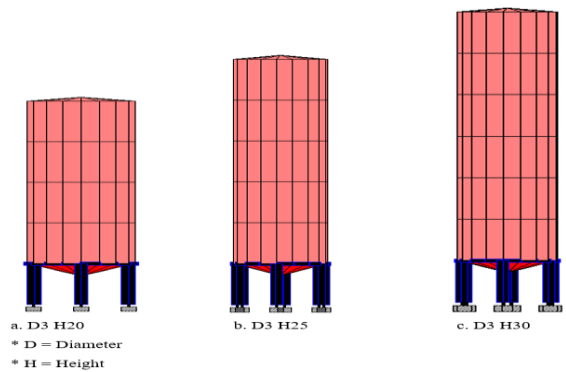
Elevation views of Silos D3-H20, D3-H25, D3-H30
